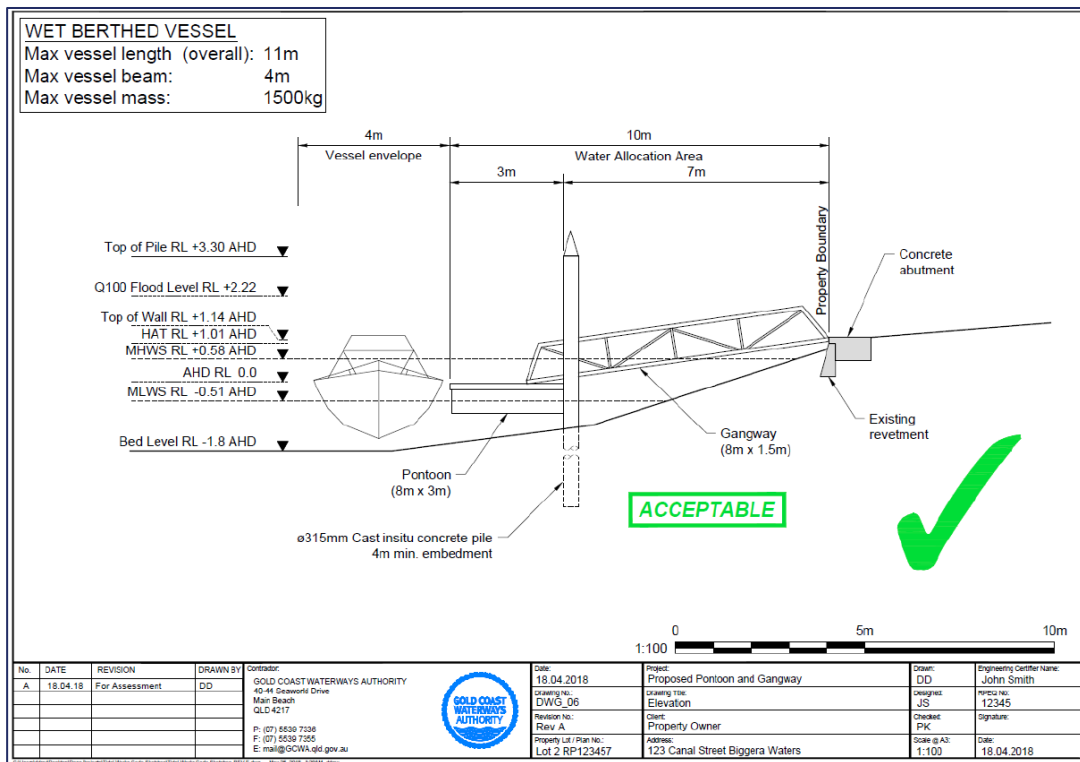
Example of acceptable site elevation showing vessel in berthing position
